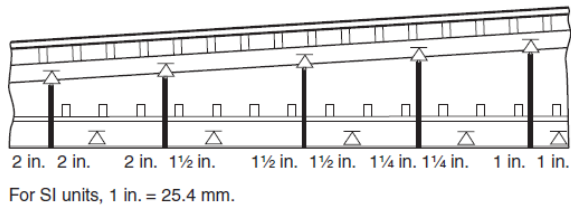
(a) Arrangement of Branch Lines Supplying Sprinklers Above and Below a Ceiling.
